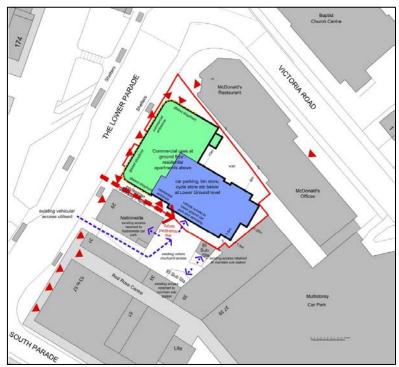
Proposed parameters plan - maximum building height of 6 storeys (green) and 8 storeys (blue)
